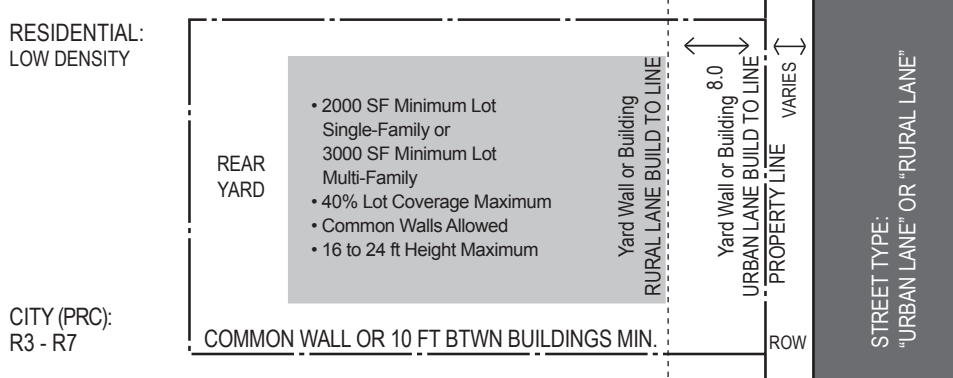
18: RESIDENTIAL - LOT PLAN DIAGRAM - STREET TYPE: URBAN LANE OR RURAL LANE
